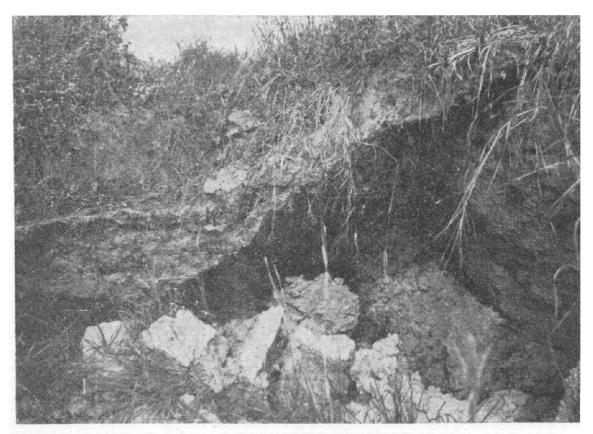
Typical failure of a scour check. In this case it has been undermined and by-passed.
